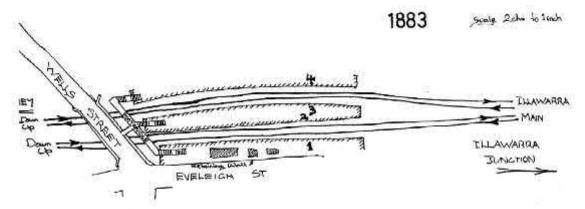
layout or the as-built layout of the station two side platforms and an island platform but only buildings on the No 1 platform. Wells Street Bridge was completed in 1884 with a simple stair access to the platforms. Drawing courtesy of Estate of Martin Davies from private report titled NSWGR – Devonshire St to Illawarra Junction Part 1 – University Historical Archaeology II Project 1978
